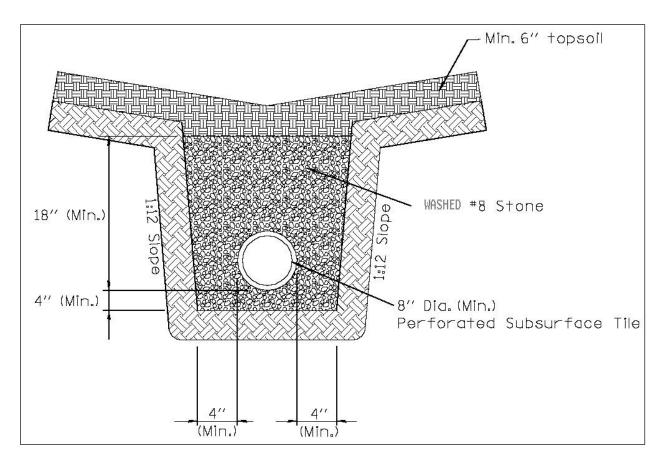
Bedding and Backfill Standards for Storm Sewers
